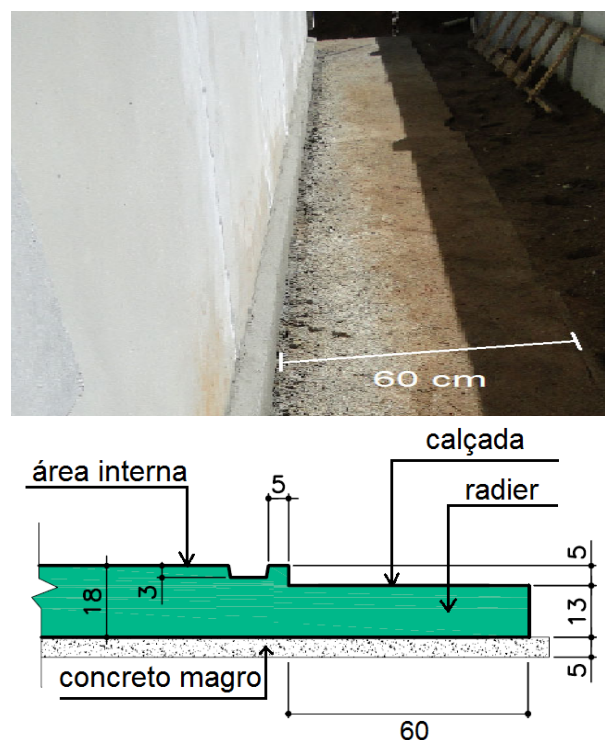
Detail of the sidewalk pointing out the dimensions.
